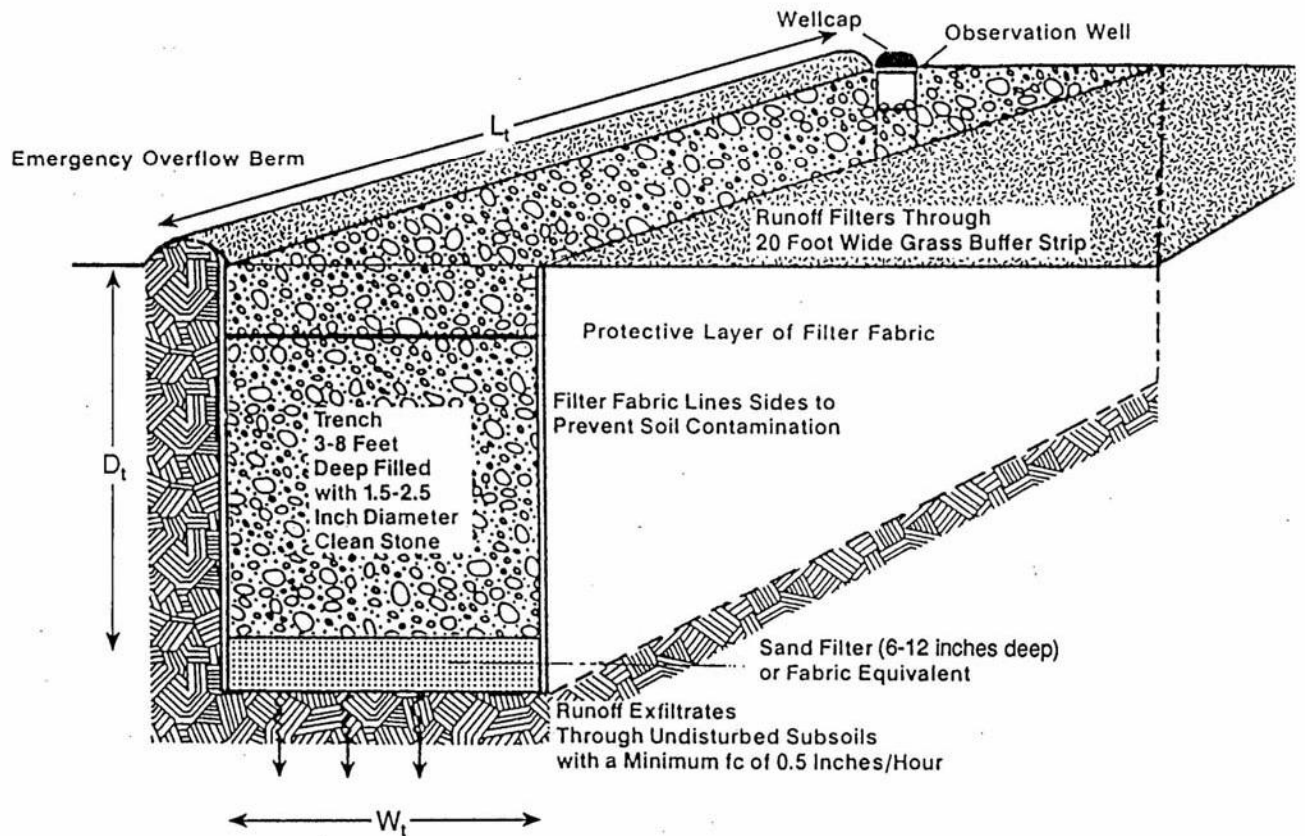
INFILTRATION TRENCH DETAIL
